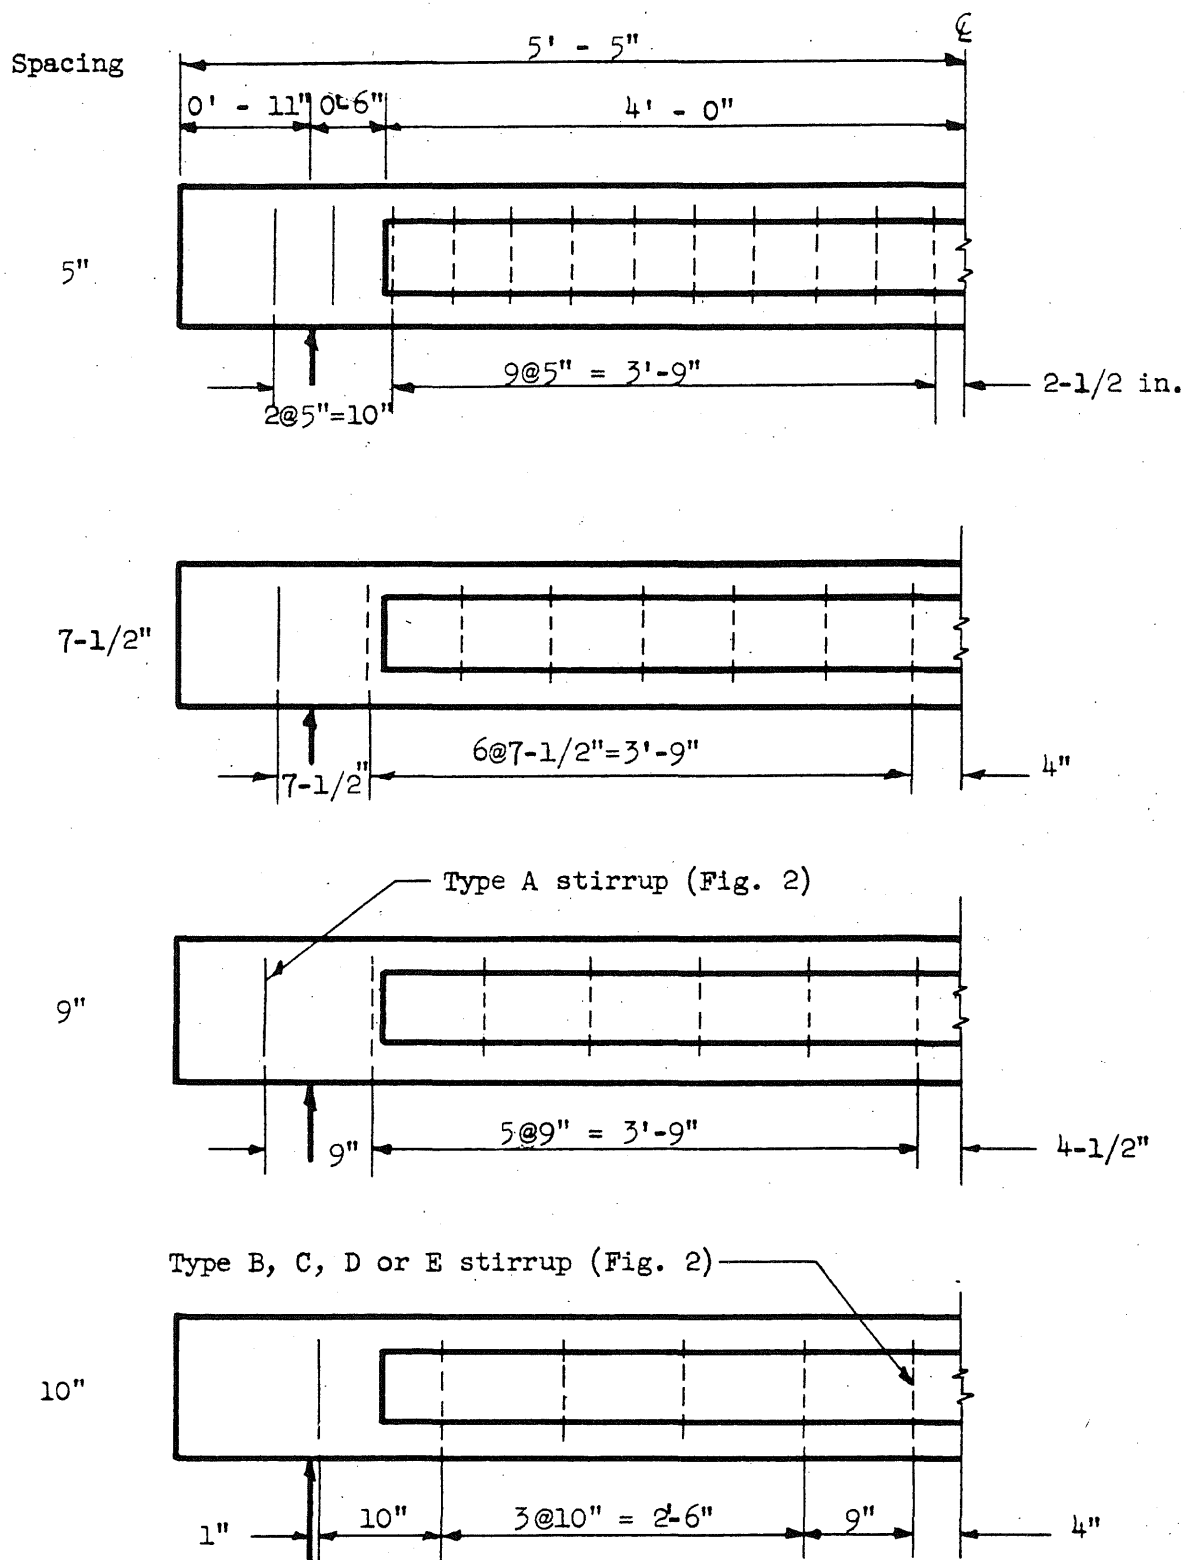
ARRANGEMENT OF STIRRUPS. SPACINGS 5 TO 10 IN.
